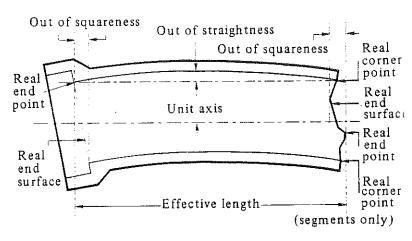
Section through, or plan of, nominally straight lining unit (Diagrammatic only).
